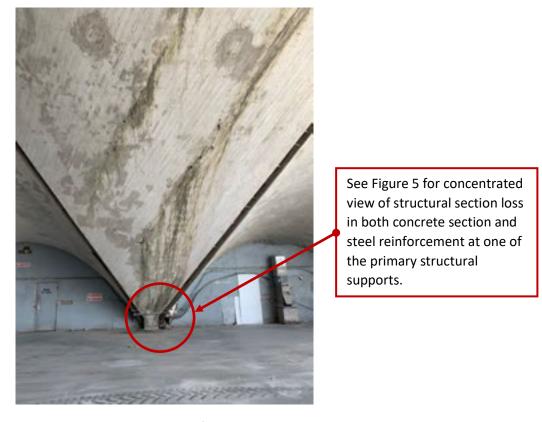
Severe concrete spalling and corroded steel reinforcing at existing primary structural support.
